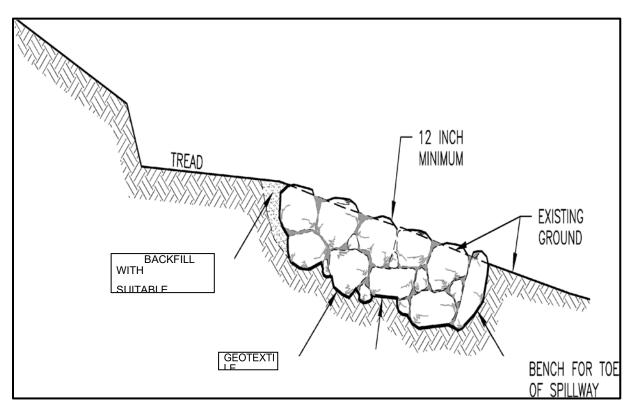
shows a Typical Rock Spillway for a Culvert Outlet.
